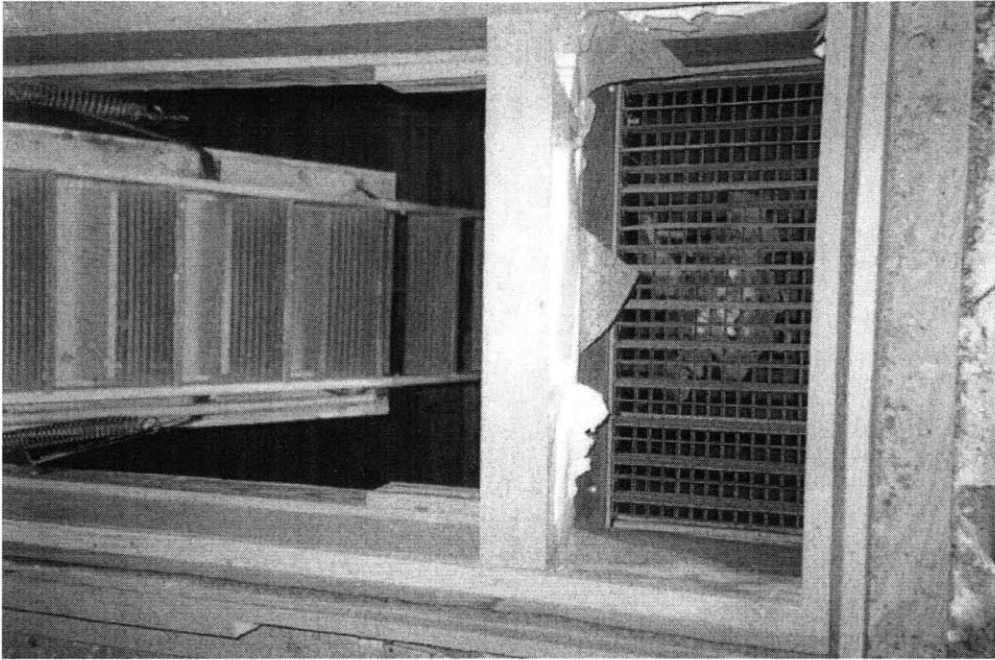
Stack vent. The staircase to the left is typically in a folded position, leaving the vent on the right as the sole means for warm air to rise into the attic.
